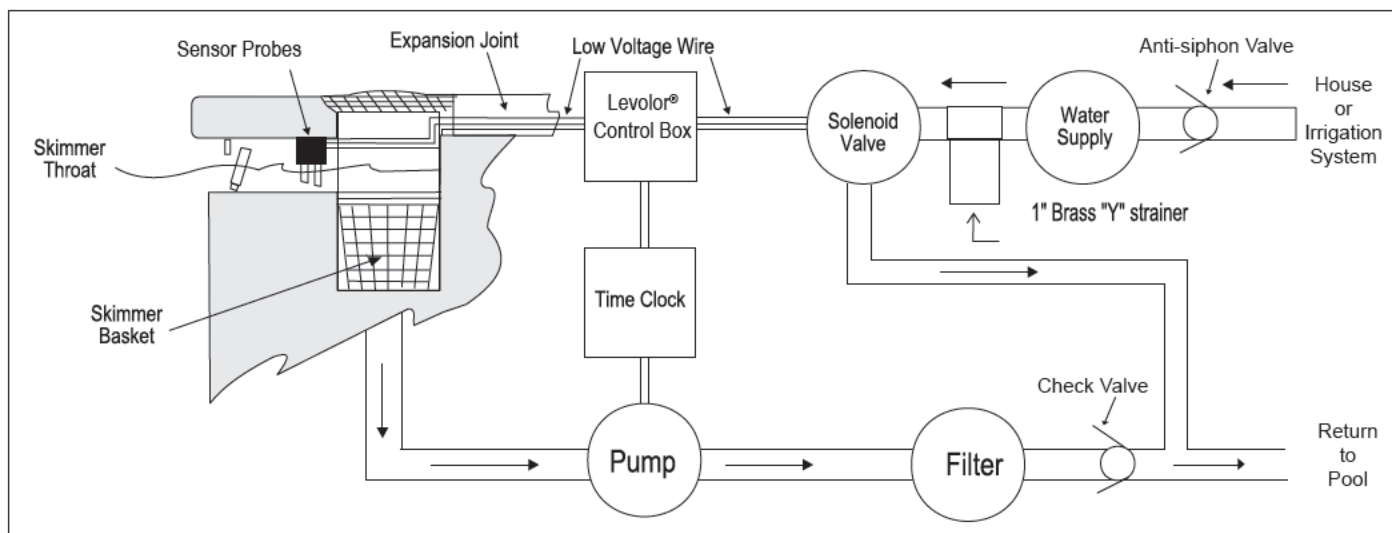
Skim (Half-moon) Sensor in Skimmer Installation in Existing Pool
